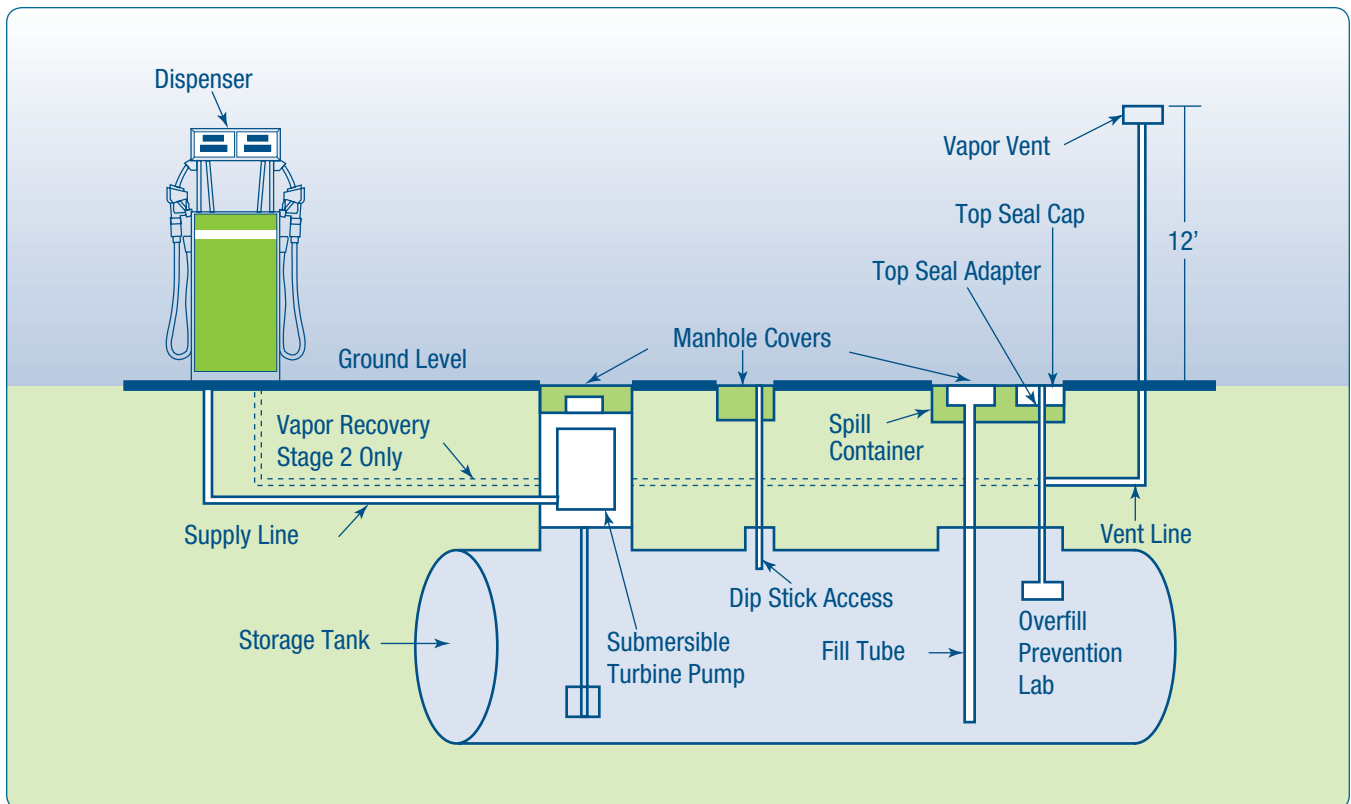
Typical Fuel Dispenser and Underground Storage Piping
